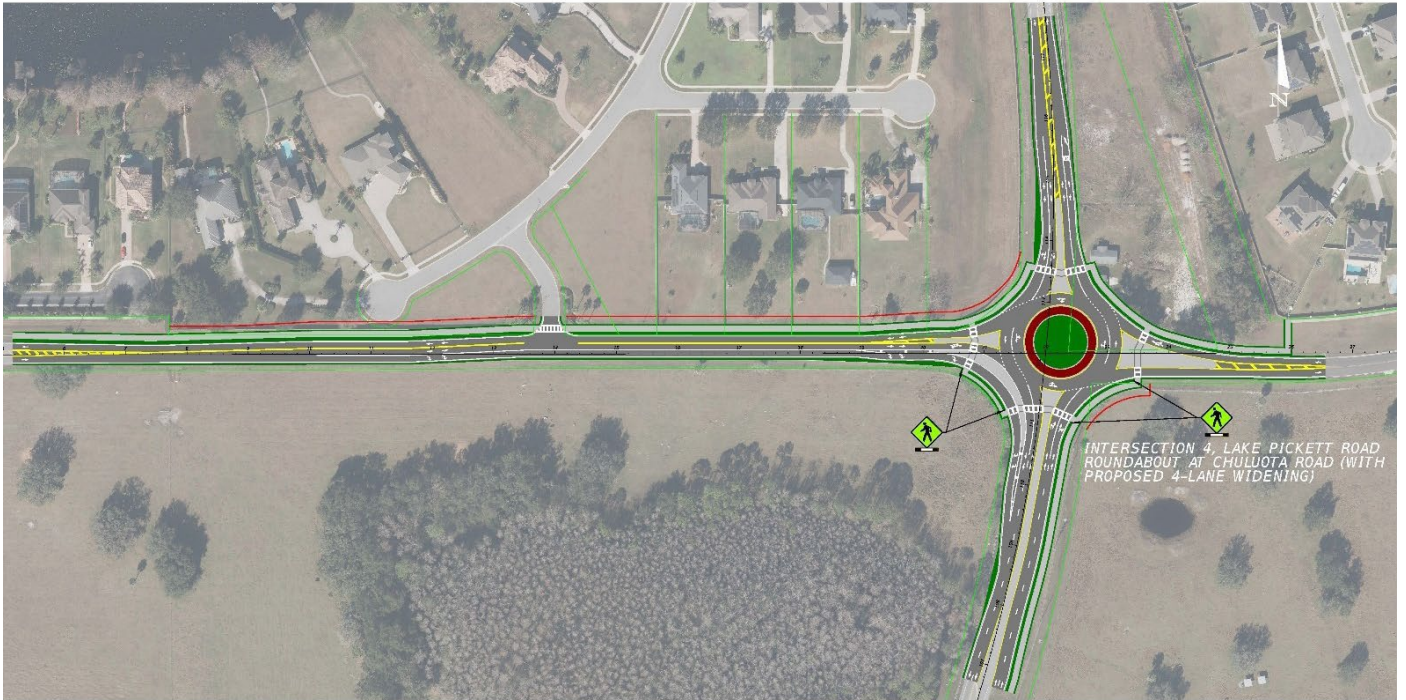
3 Roundabout Control Option at Lake Pickett Road Under Build Conditions (Four-Lane Widening Section on Chuluota Road)
